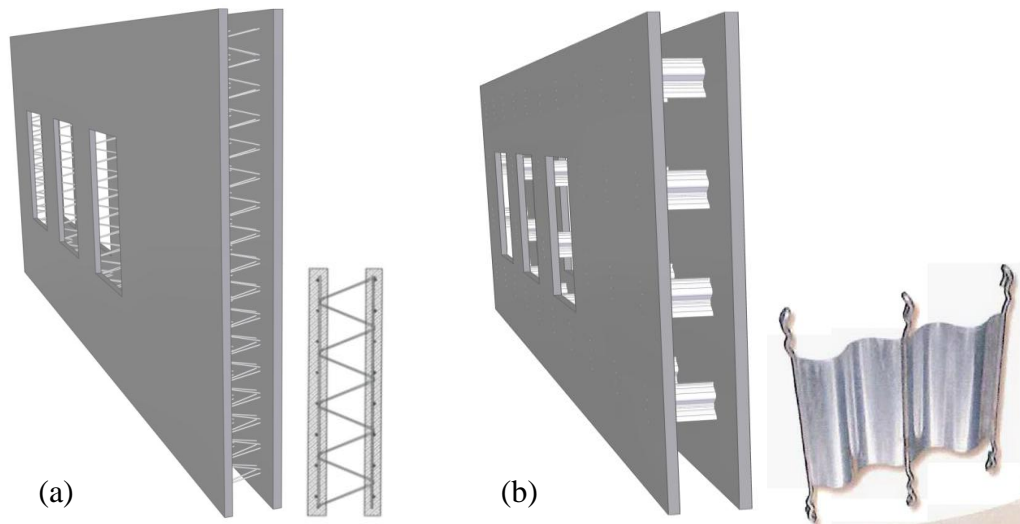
Connector Systems; (a) Girder System, (b) KAPP-Wave System
